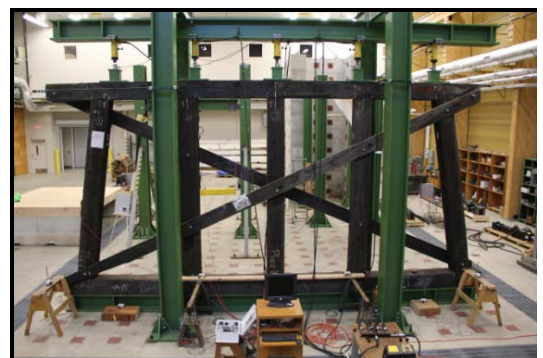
Column-bent substructure re-assembled for laboratory evaluation.
